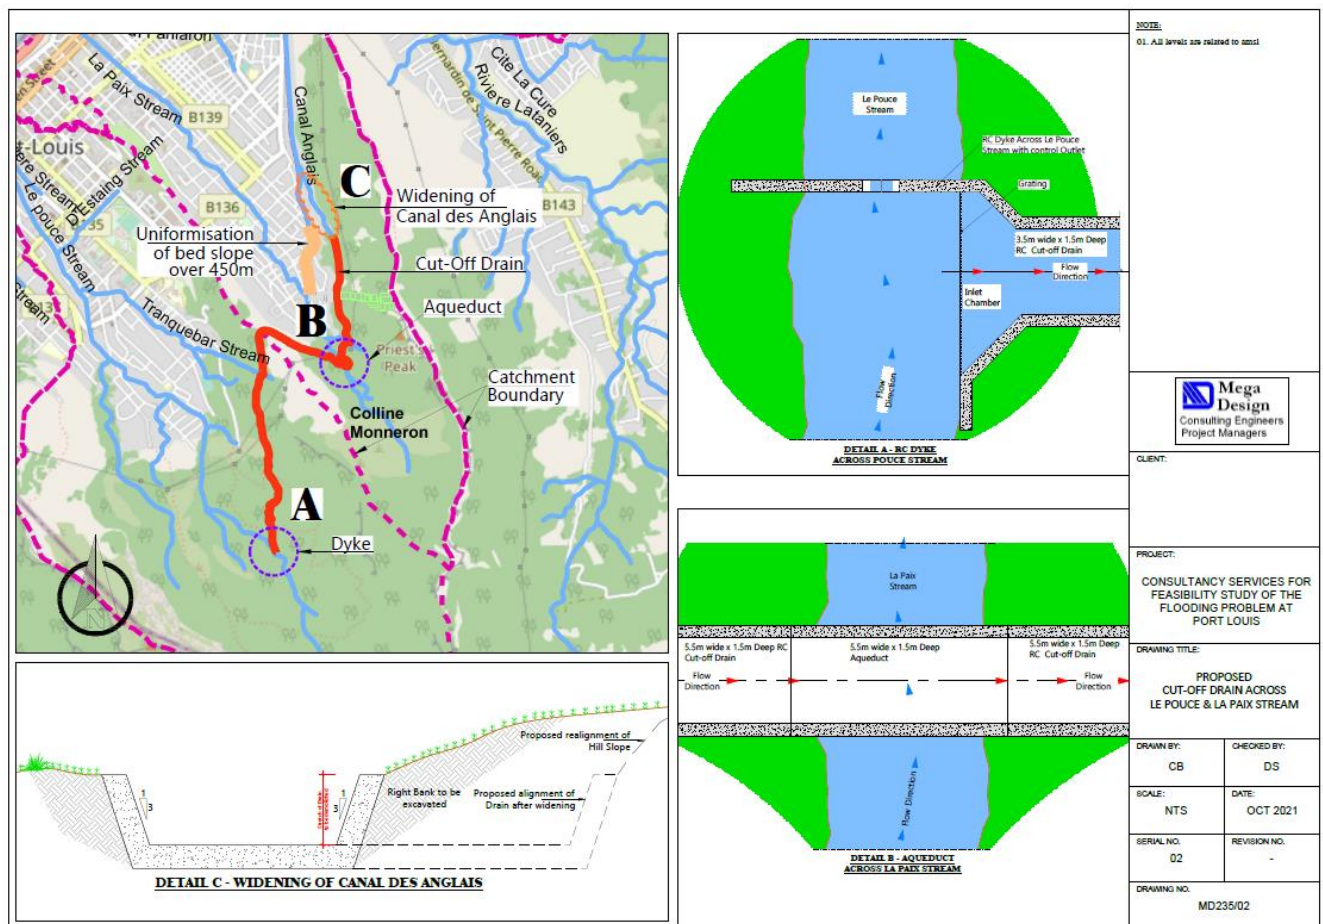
Pouce Stream – Upstream cut off drain proposal – Detail
